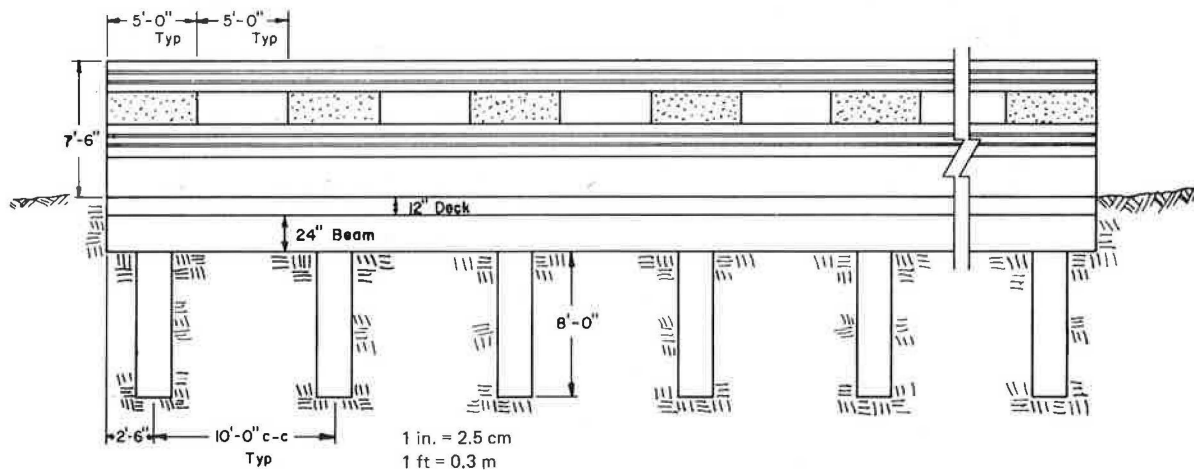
Elevation (from field side) of modified T5 bridge rail.
